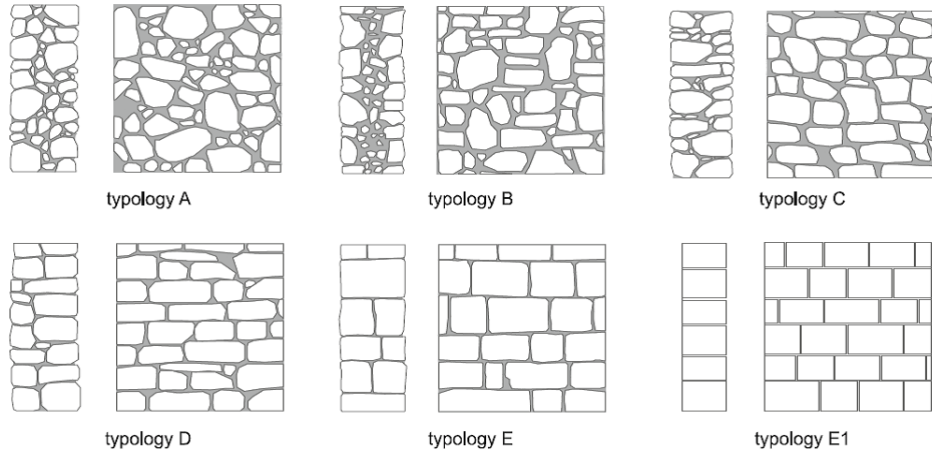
Stone masonry typologies: sketches of typical textures and cross-sections
